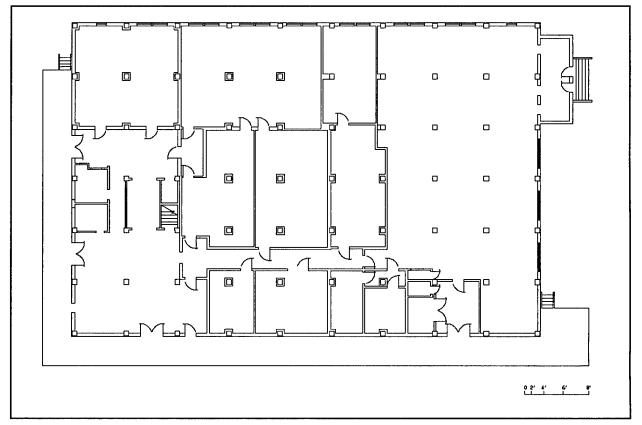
Example of an Industrial warehouse floor plan (Building 2010).
